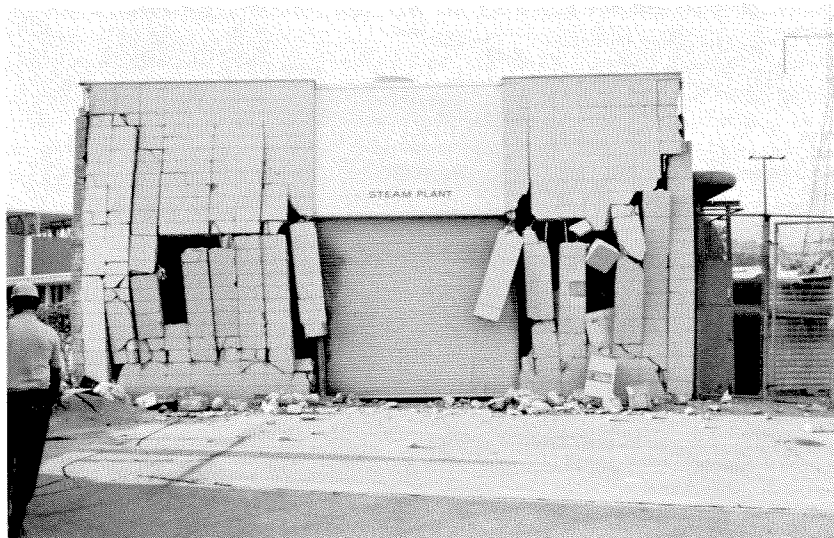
Walls of steam plant building at San Fernando Juvenile Facility were shattered.
